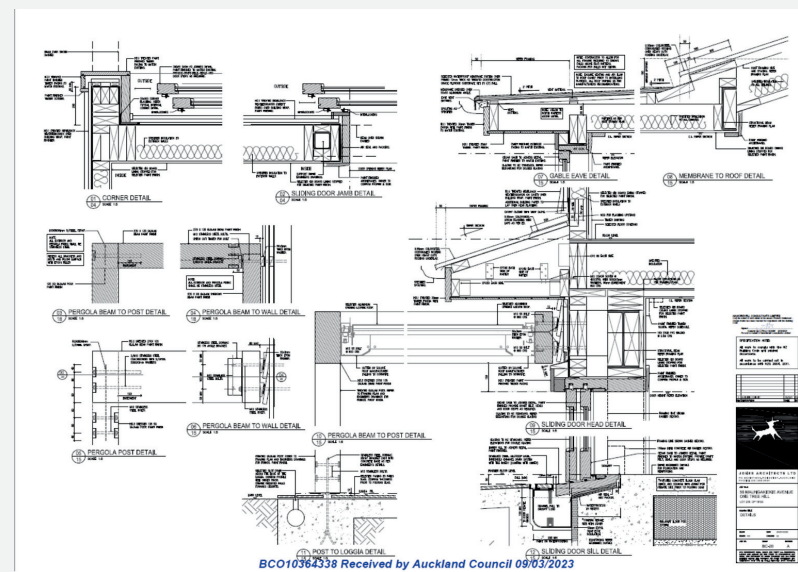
Example of an A1 drawing sheet that will be illegible on a standard monitor
